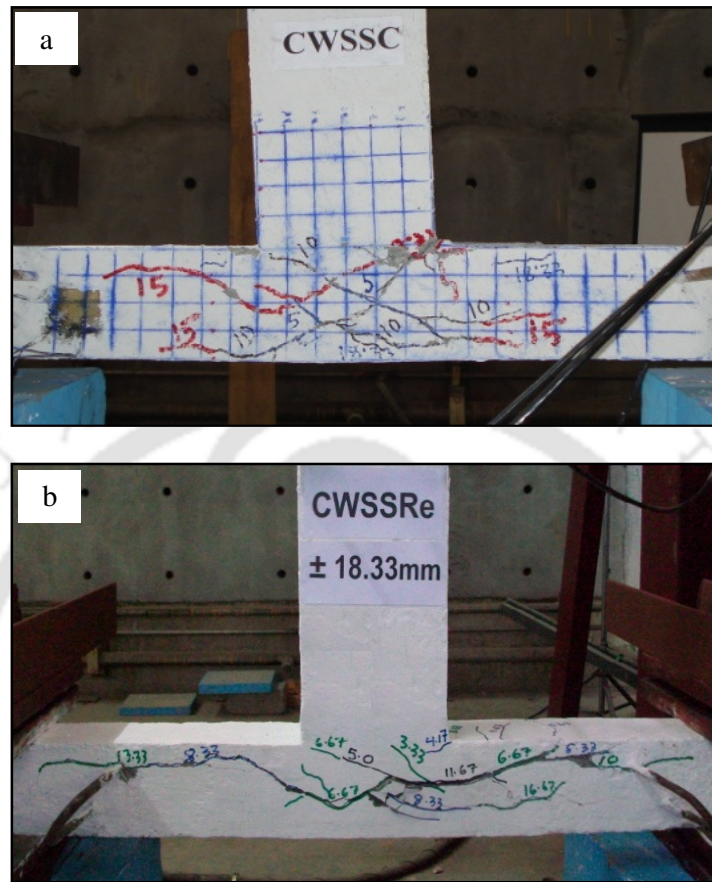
CWSS specimens at the end of test under loading type-1:
